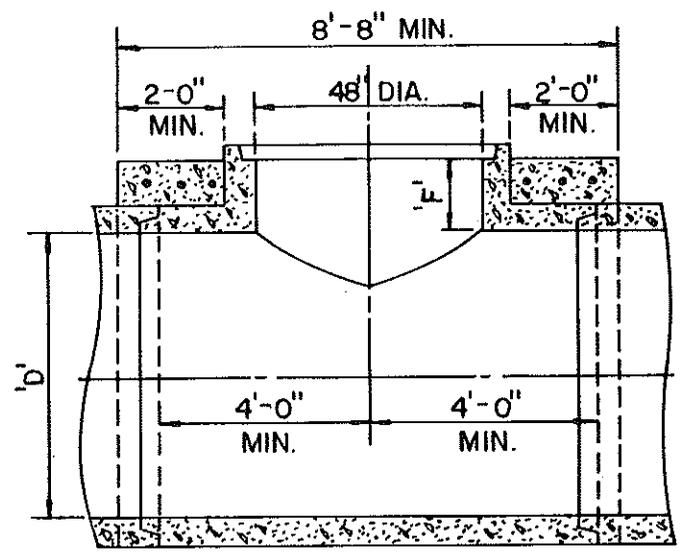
<b>STANDARD DETAIL</b>	<b>STORM DRAIN MANHOLE BASE (48" AND SMALLER)</b>	DETAIL NO. 520
